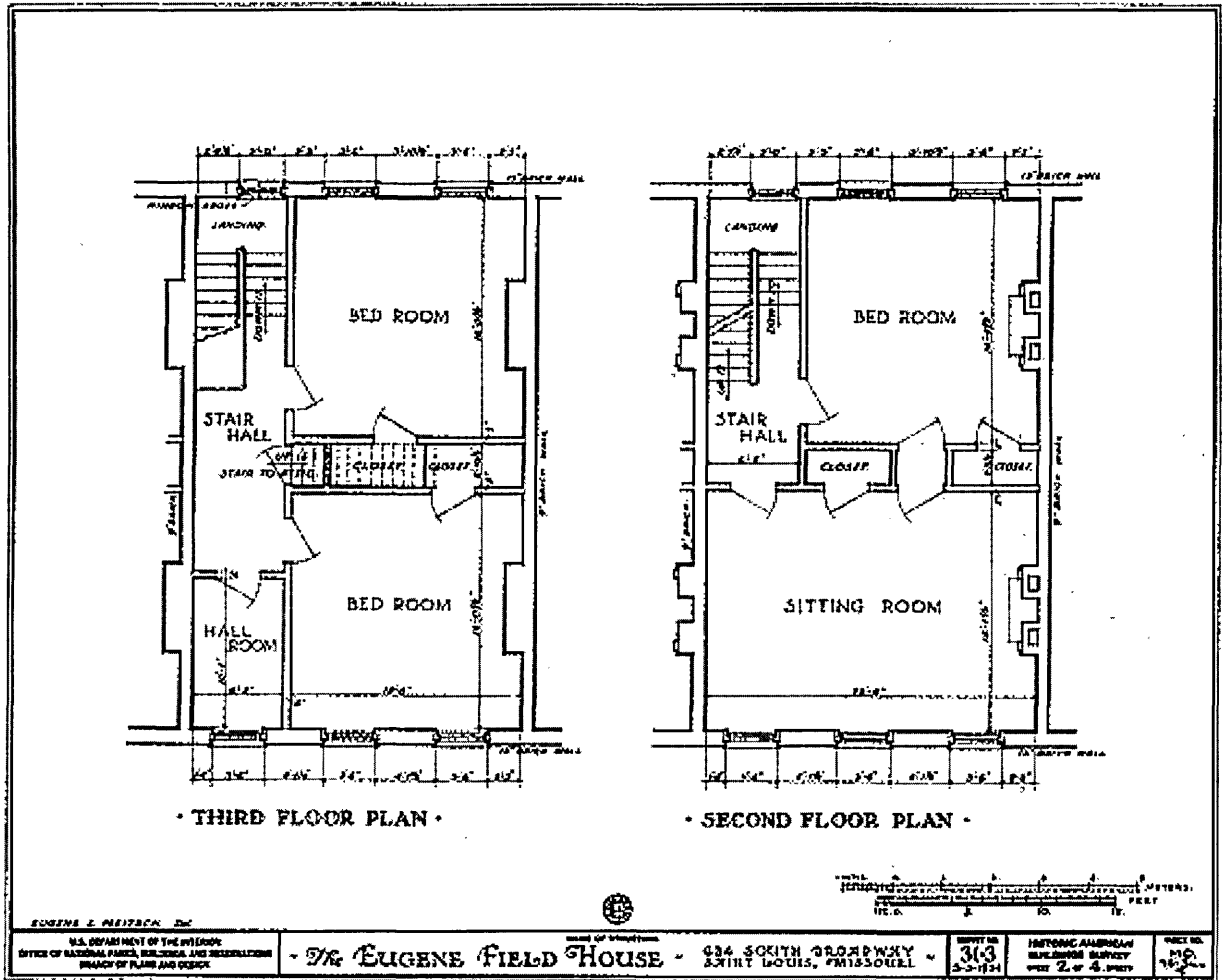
Eugene Field House Floor Plans – Second and Third Floors
